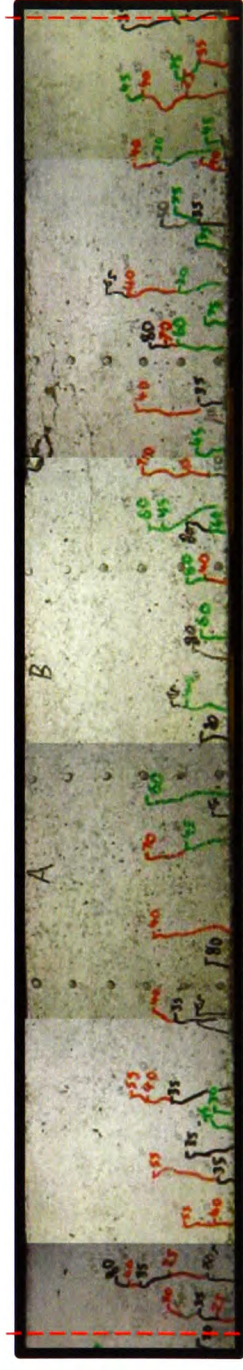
(c) – Photograph of crack pattern for 12CF3 within constant moment zone at failure
